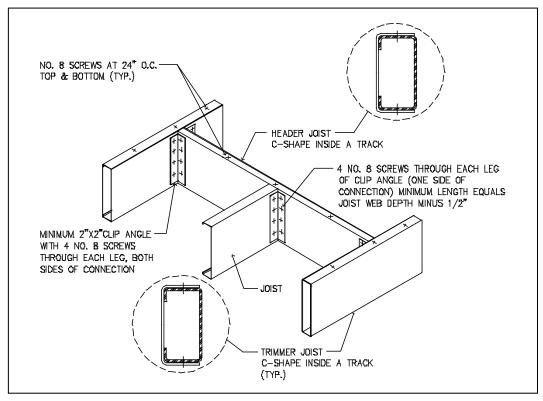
Floor Header to Trimmer Connection—Six-Foot Opening
